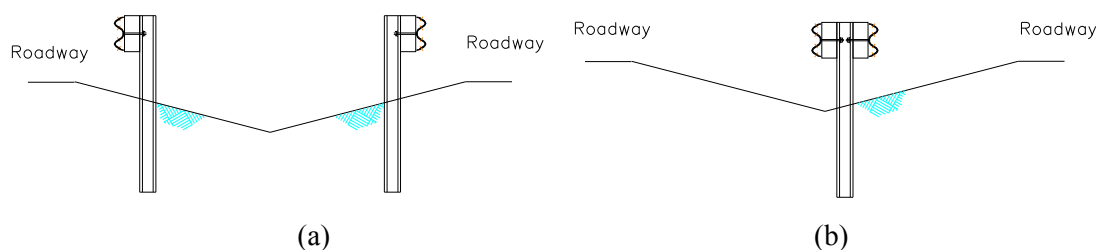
(a) Single-sided modified G4(1S) guardrail used to protect vehicle traveling from one side, (b) Double-sided modified G4(1S) median barrier used to protect vehicle traveling from either side.
